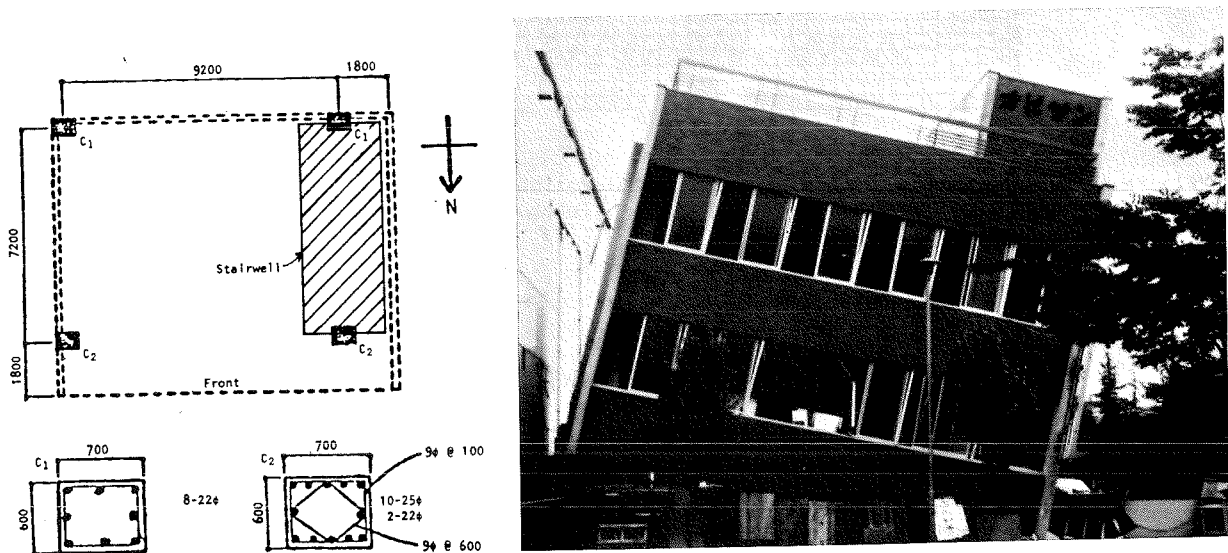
Obisan office building, Oroshicho area, Sendai: view from the north. The building was completed in 1969. It is a 3-story reinforced concrete frame building with a soft first story, one span in each direction, supported on four columns. The building has 1.8-m overhangs on the north and west sides of the upper floors. The stairwell is also placed eccentrically on the west (right) end of the building. The four corner columns of the ground floor were inadequate to resist the torsional force caused by the heavy eccentric masses.
